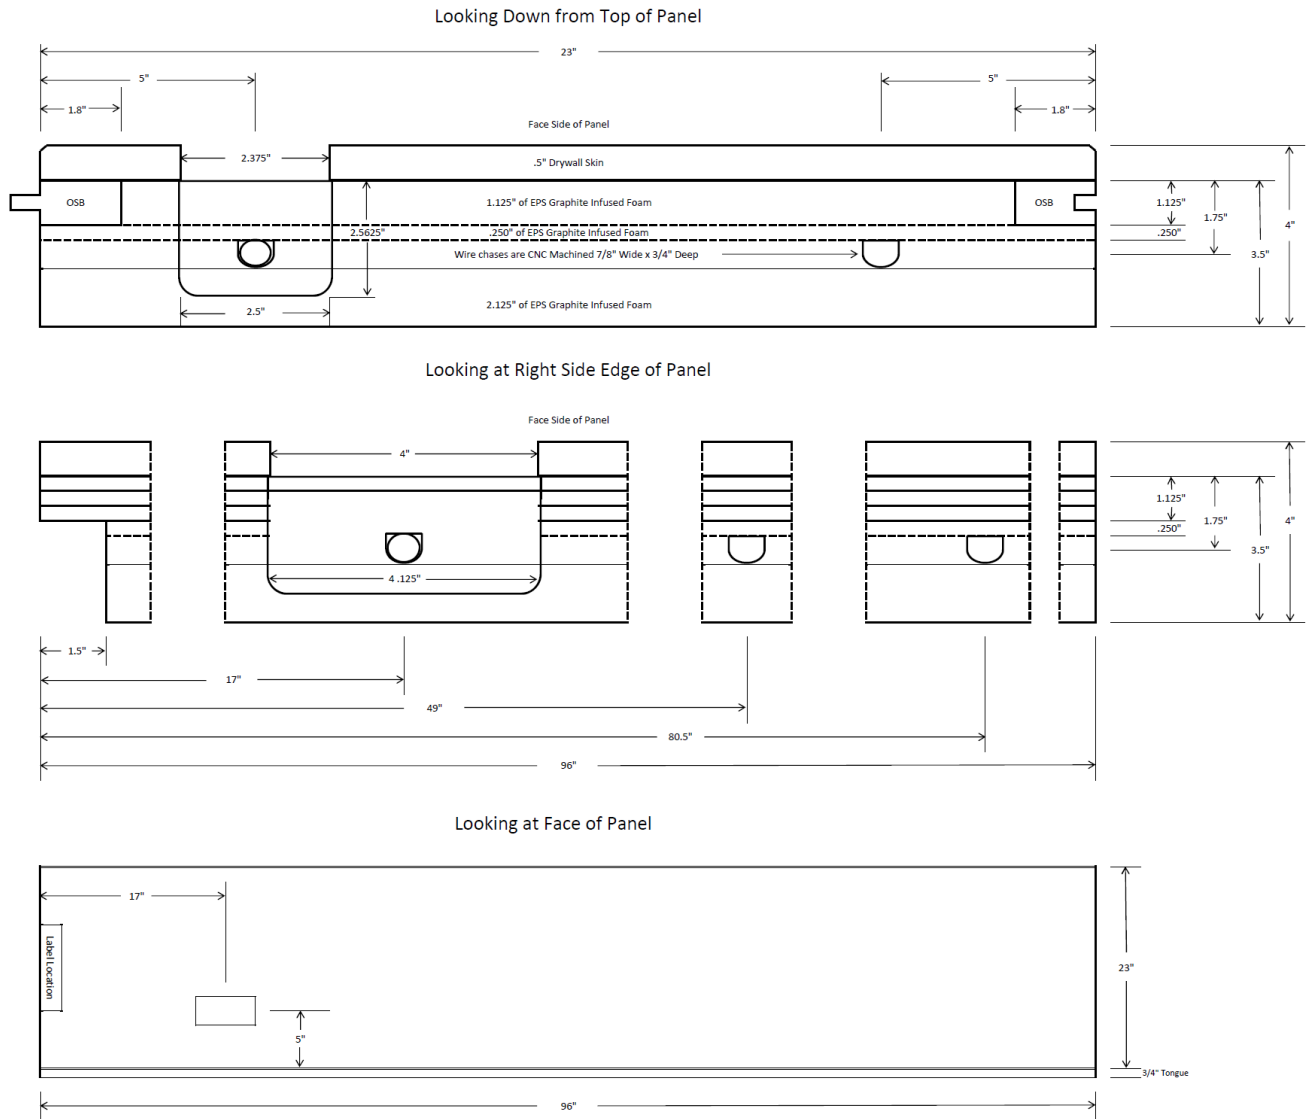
SmartWall Plug Panel, Dimensional Overview
